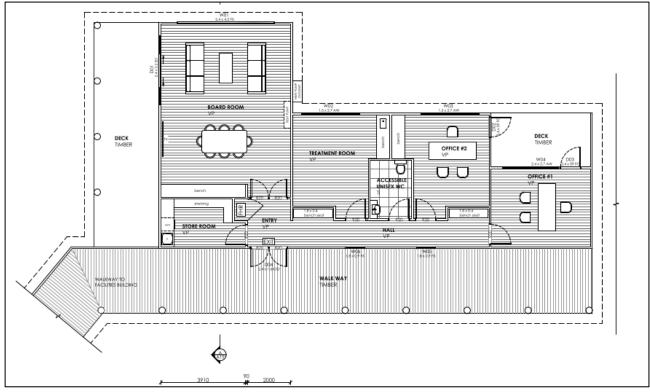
Facilities Building #2 - floor plan (Source: RFS Projects)
